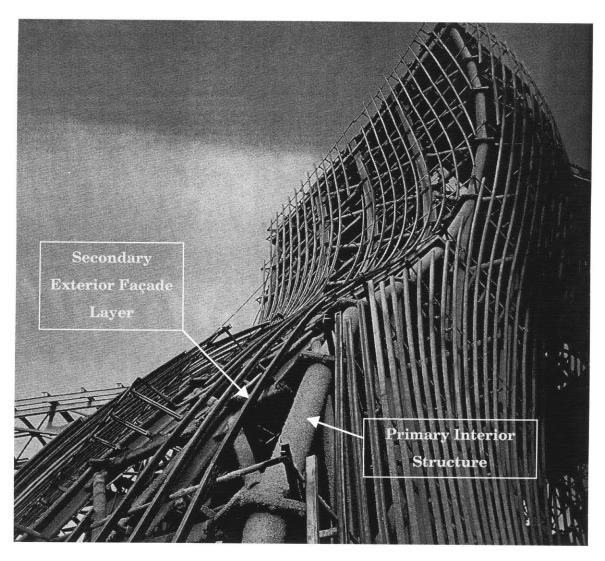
Exterior Structure and Exterior Façade Support Structure<sup>(5)</sup>
